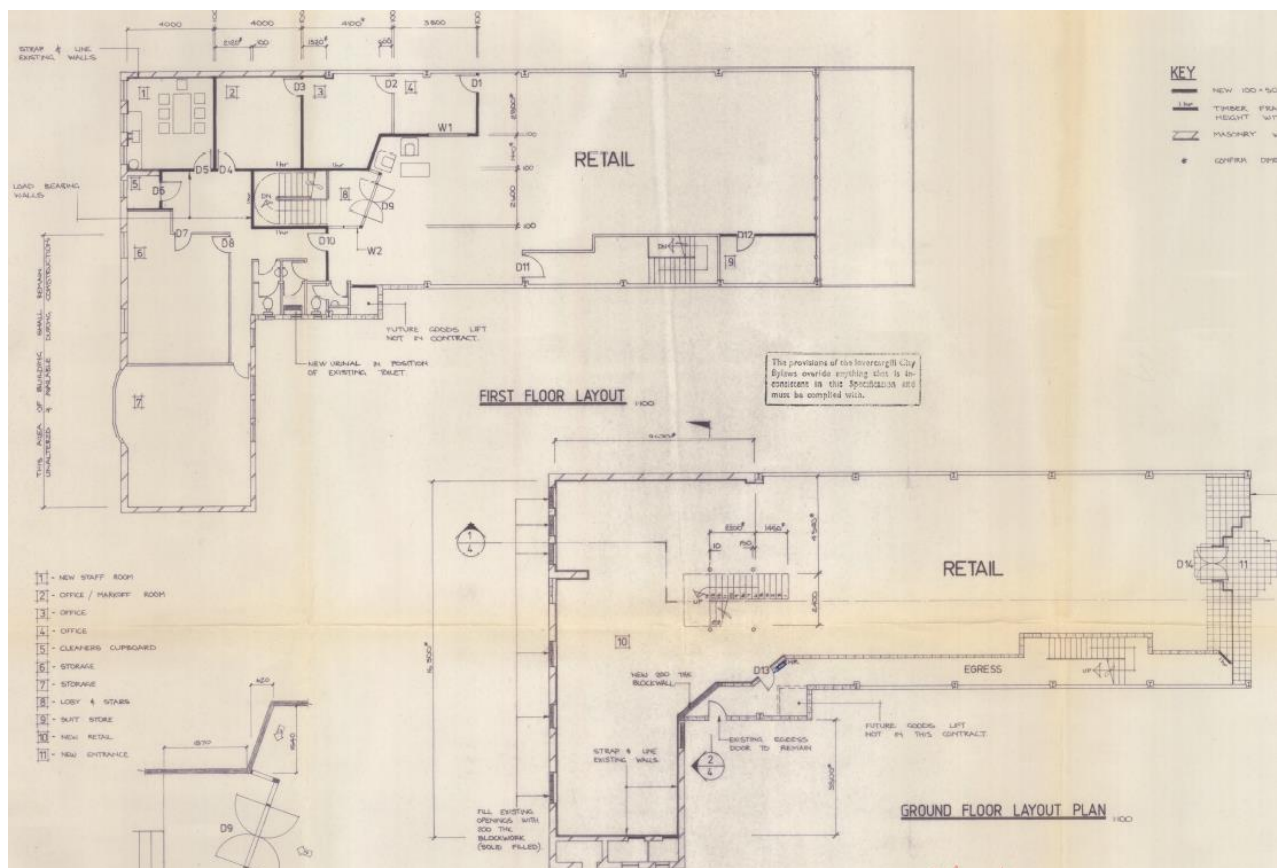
Building floor plans showing the 'new' and L-shaped rear 'old' parts of the building (Tay St to right hand end)
